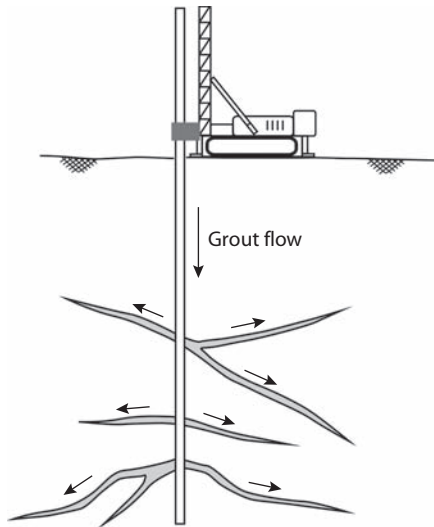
Rock grouting. Liquid grout is injected at a steady pressure to fill or partially fill fissures within the rock.
